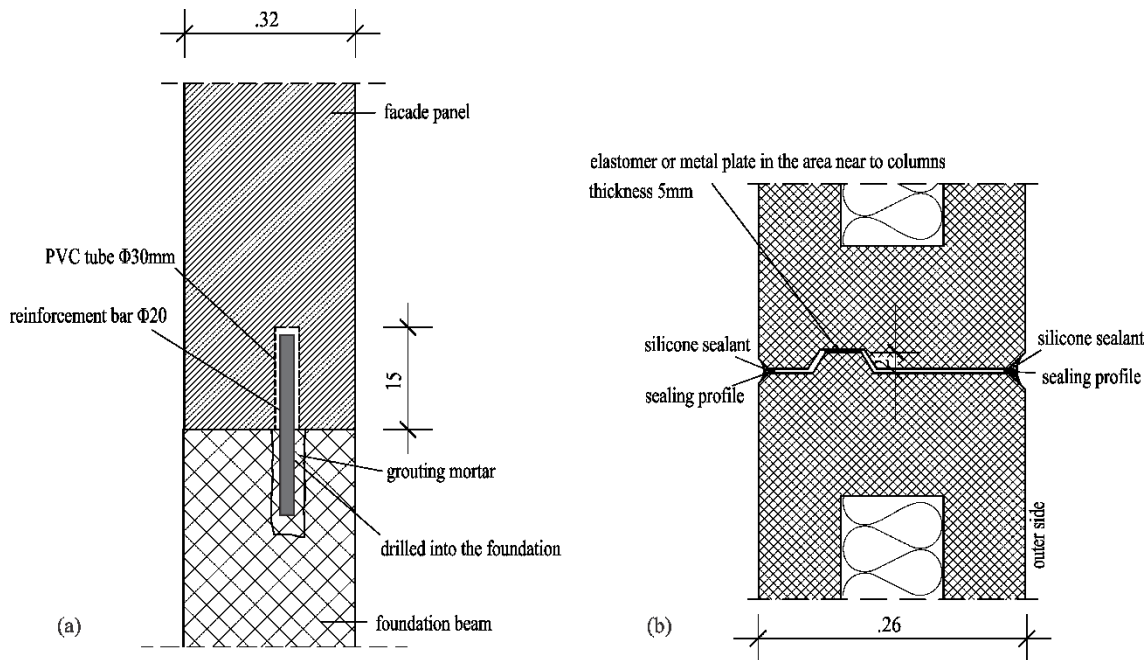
Cladding connections: (a) a connection between the cladding panel and the foundation beam and (b) a connection between adjacent cladding panels (Bužinel, 2019)
